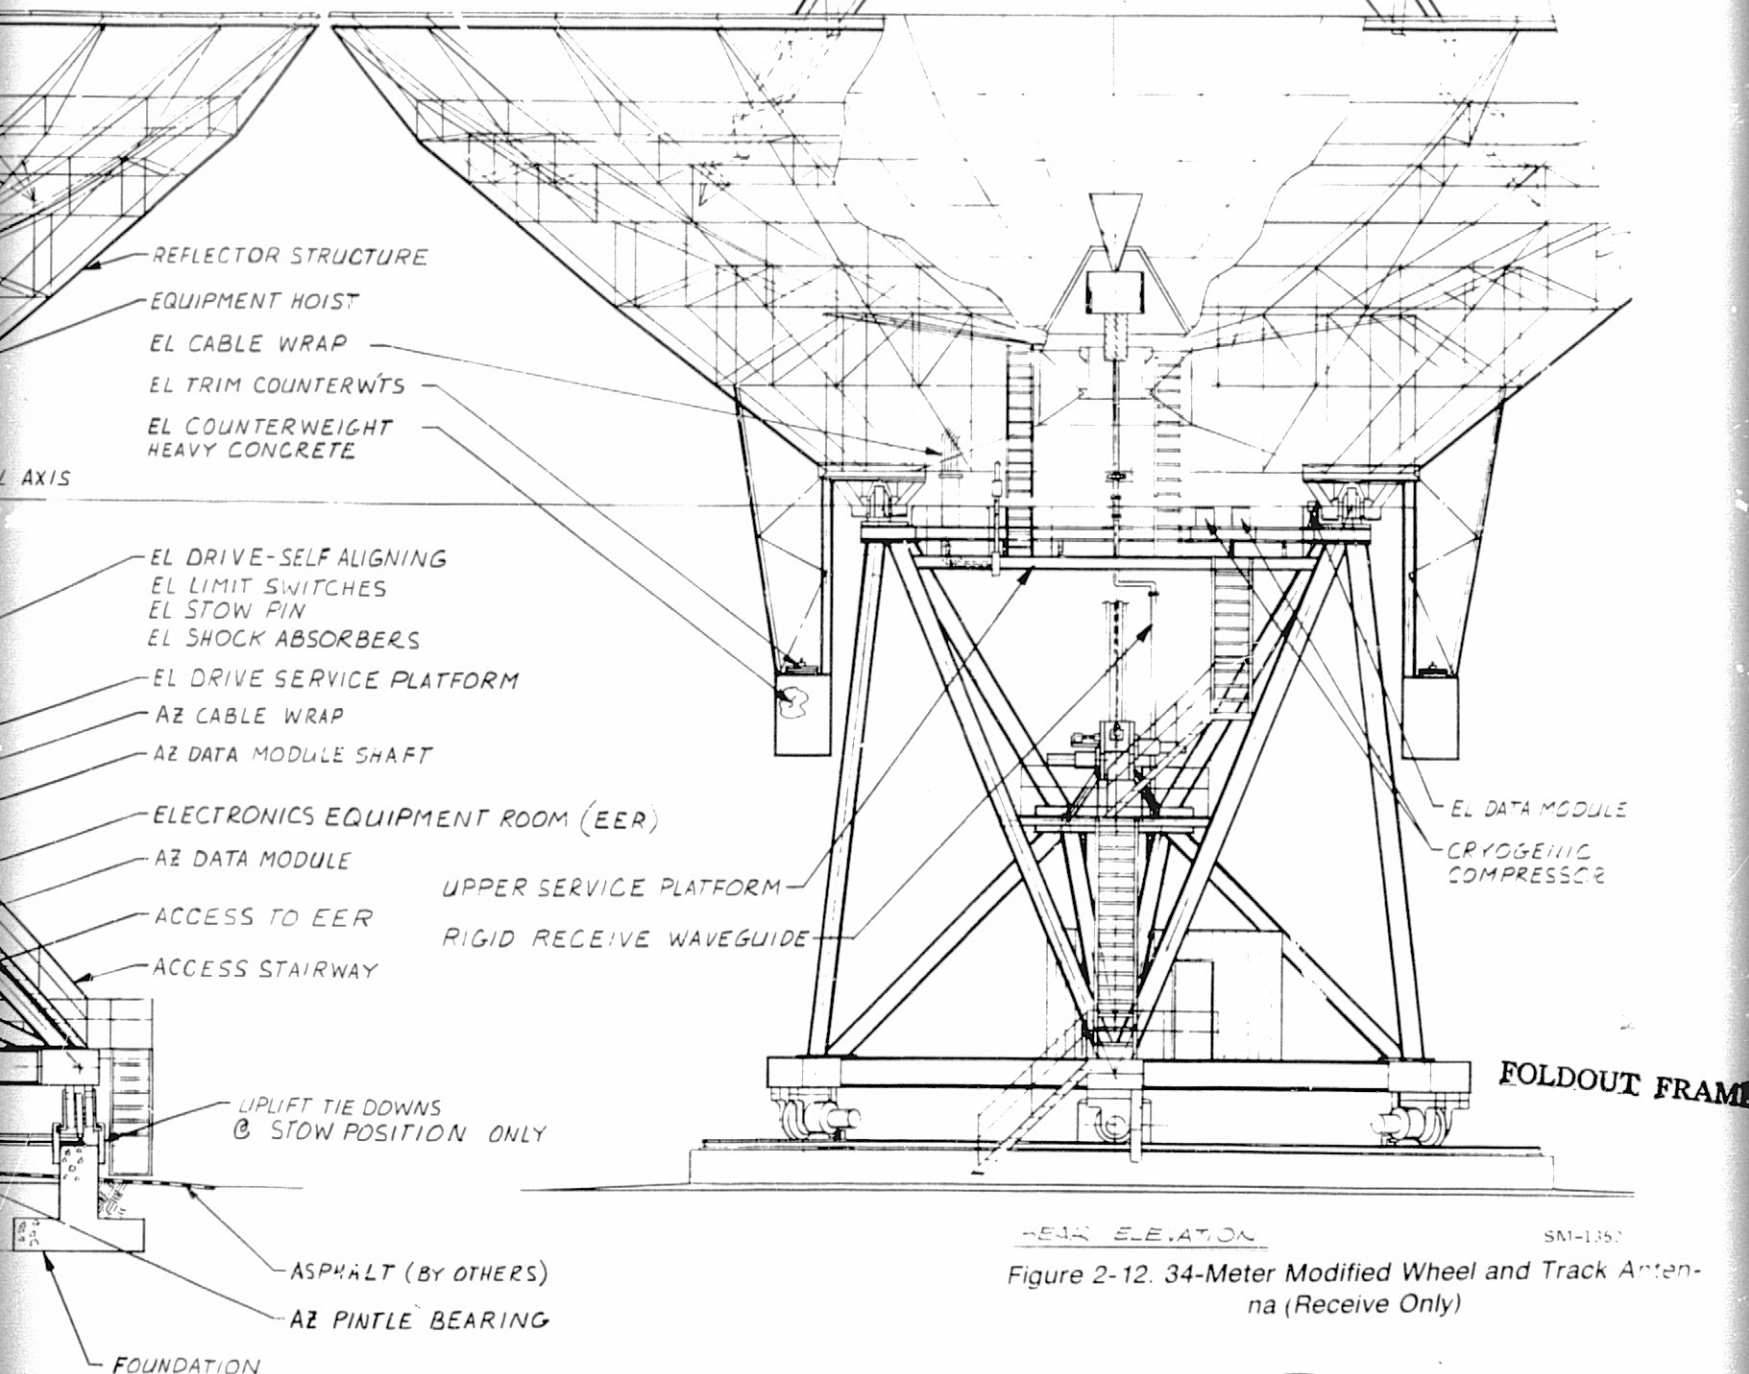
34-Meter Modified Wheel and Track Antenna (Receive Only)
